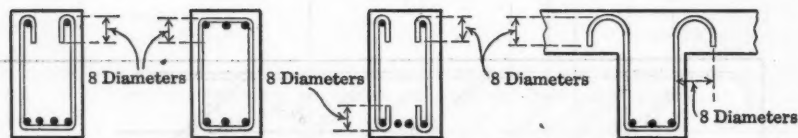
TYPICAL METHODS OF ANCHORING VERTICAL STIRRUPS.
